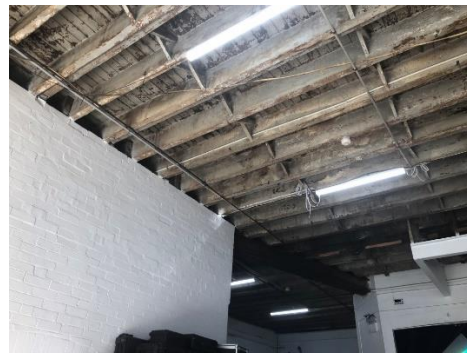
Floor structure in Character Building 2, viewed from the ground floor, showing timber joists and beams on brickwork
